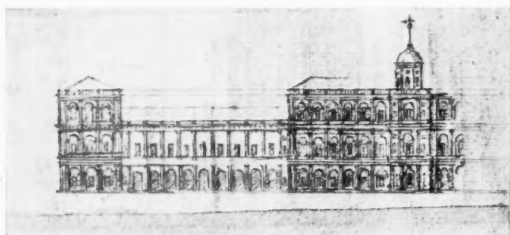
PRELIMINARY SKETCH FOR HALF THE WEST ELEVATION OF FIG. 7, BY JOHN WEBB
